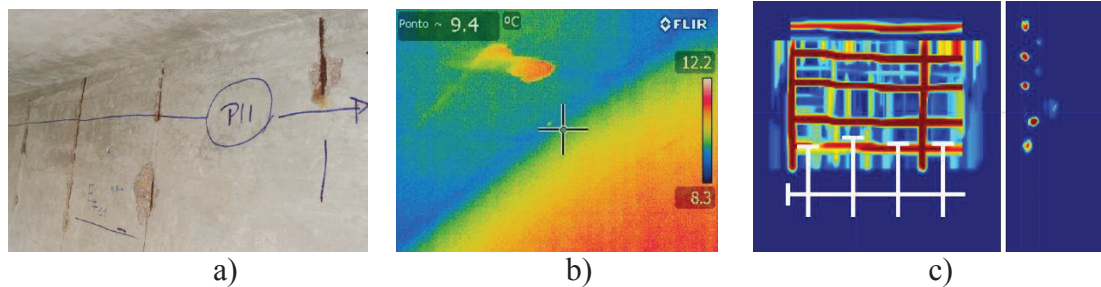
Inspection techniques: a) photography record of corrosion and delamination; b) infrared thermography image; c) GPR image obtained with a steel rebar detector.
